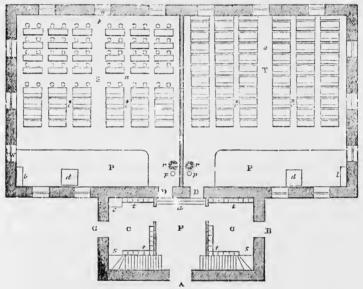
Ground Plan of Girls' School, adapted to Design No. 31,
